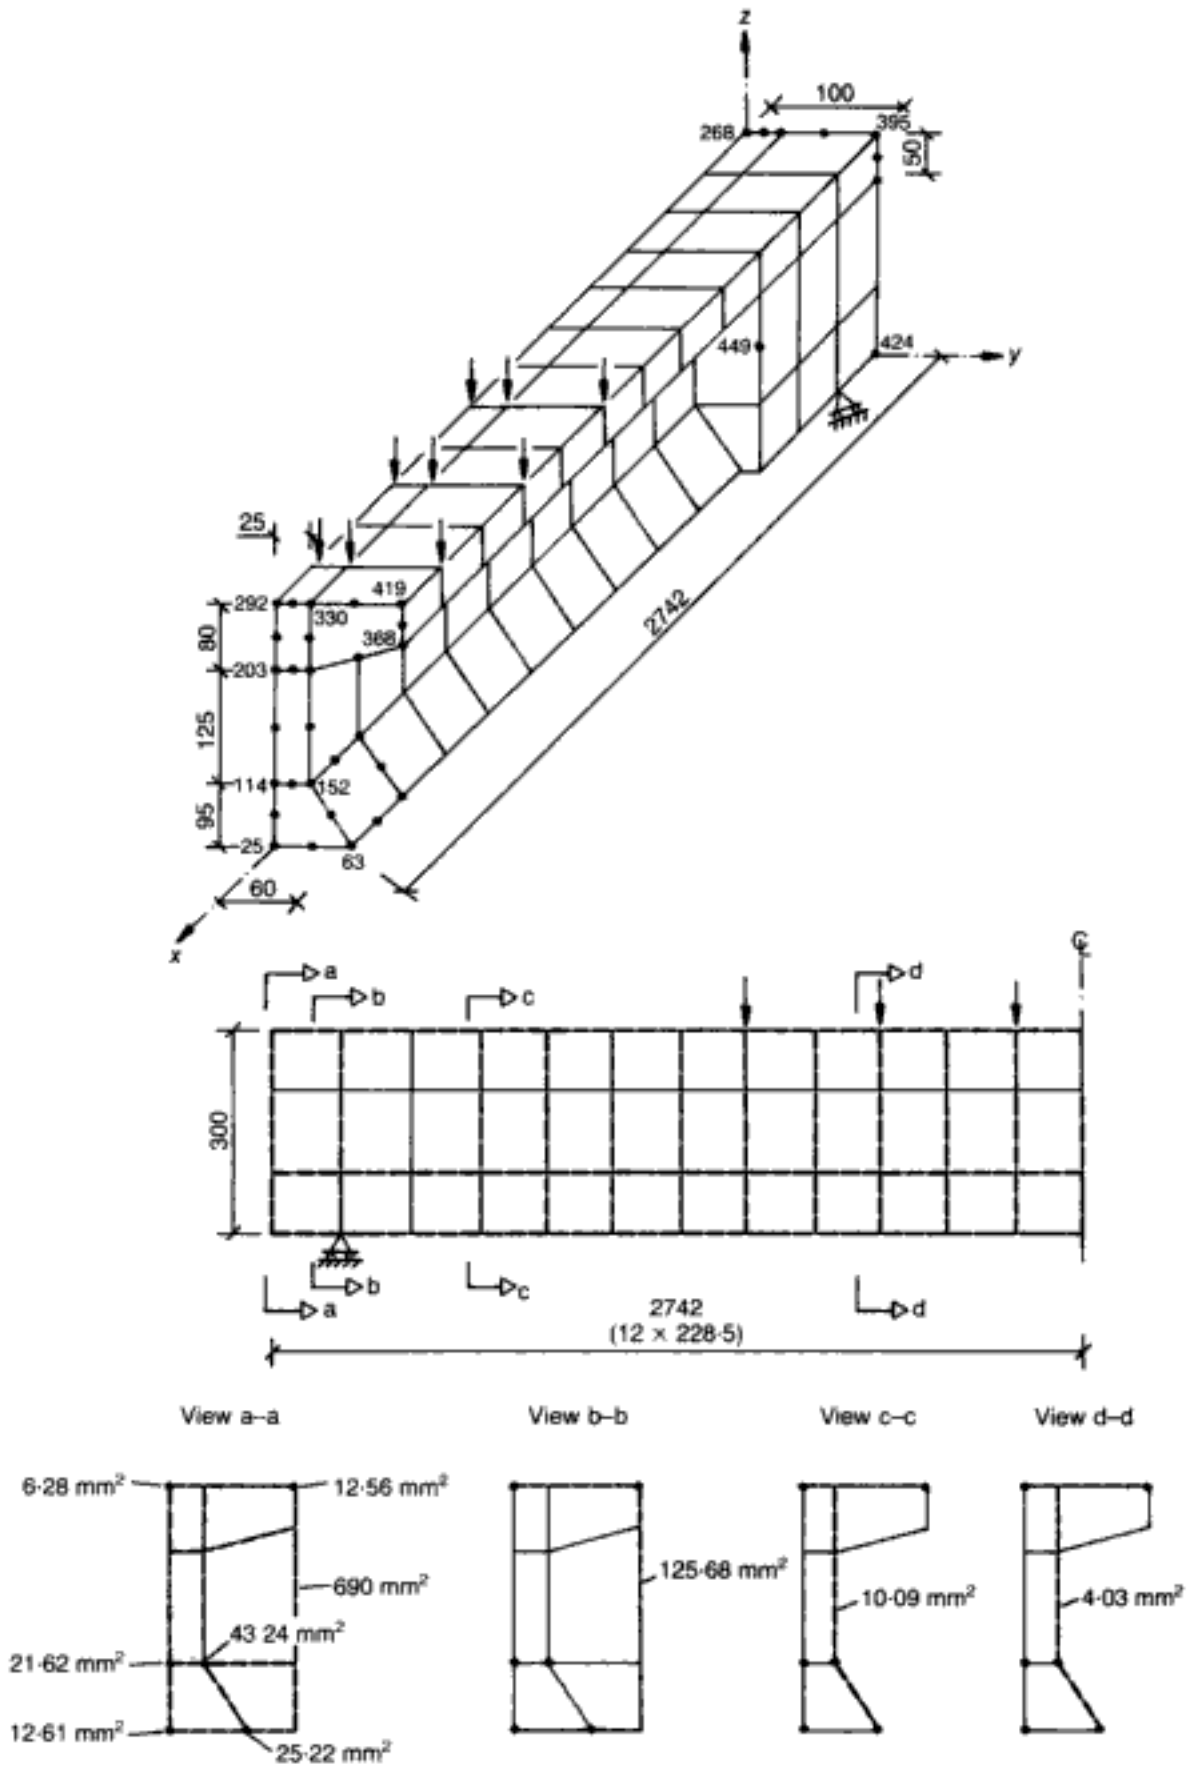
Beam PCB3. FE mesh for one-quarter of the structure consisting of 54 HX20A brick elements (all dimensions in mm)¹⁷⁸
